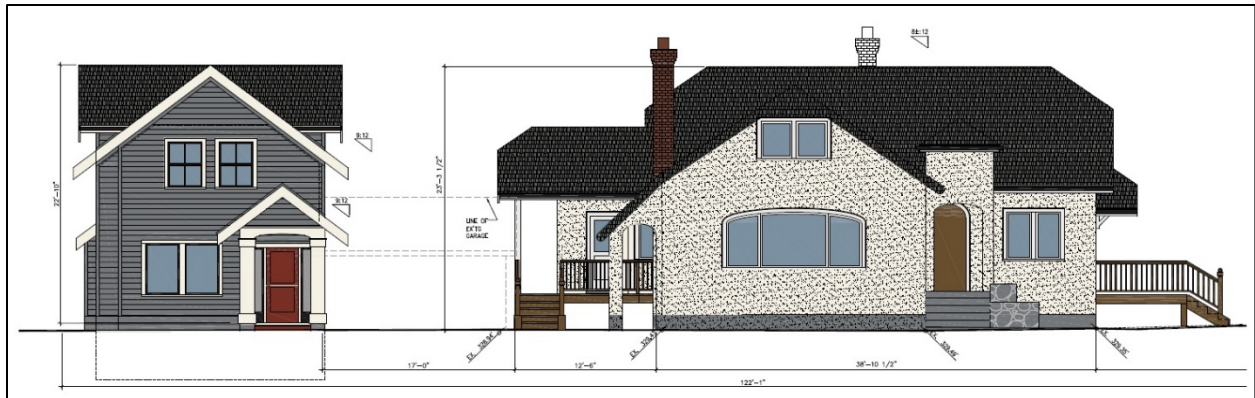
Elevation from Fourth Street of Edgar House (on the right) and its proposed laneway house (on the left), 2021. (Source: Dheilly)
